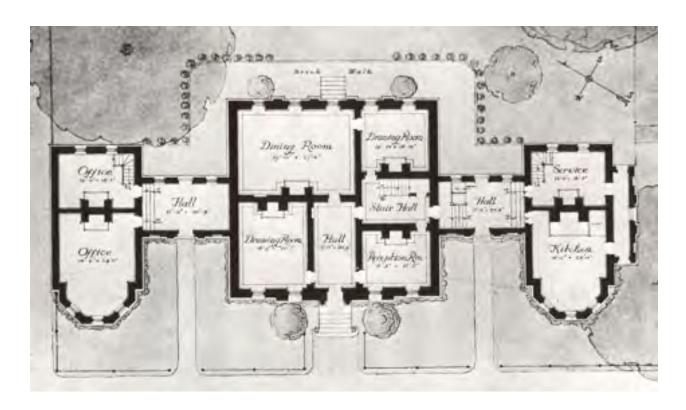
1933. Site plan of the Hammond-Harwood House. *Great George Houses of America*, 1933.
